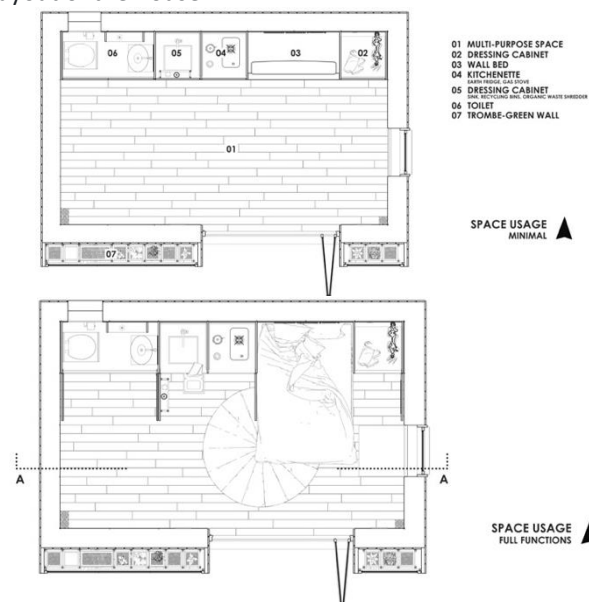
House plan. The top plan shows folded mode, and the lower plan shows the unfolded mode.
